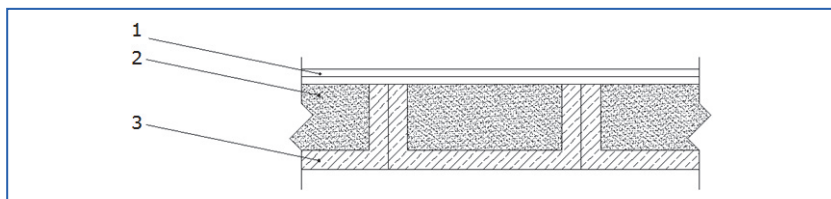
Floor. 1) Wooden floor; 2) clinker; 3) 300 mm concrete blocks.
